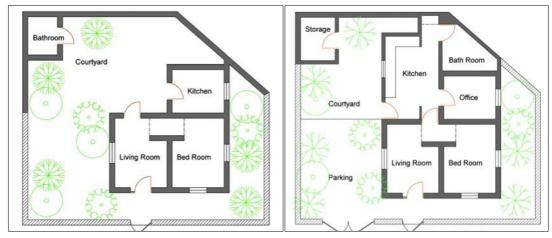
Original and adapted plan of the house (Author, 2012)
